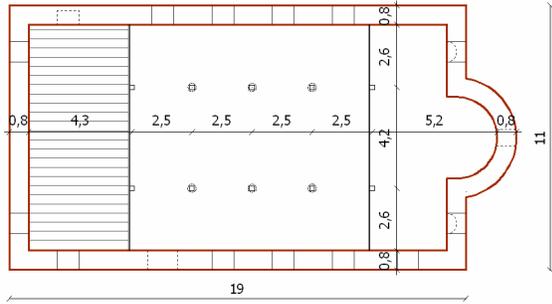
1<sup>st</sup> Post-Byzantine “Basilica”– plan
